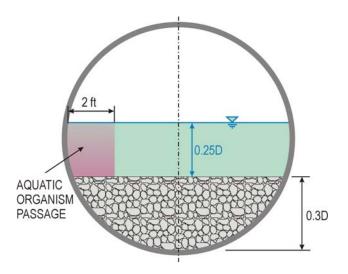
Bed Elevation at 0.30 culvert diameter and 2 ft AOP for CFD Tests
